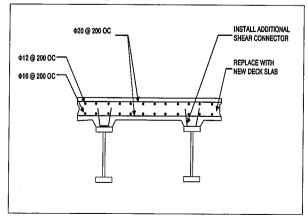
Section detail of Repair Works for Deckslab
